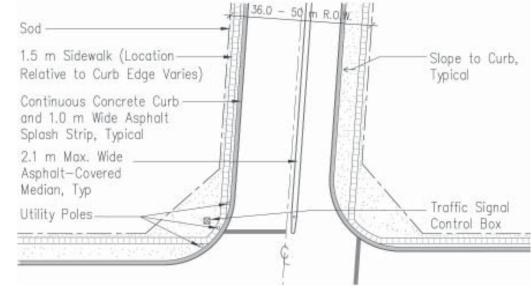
d - Plan of Arterial Intersection at Developed Areas
